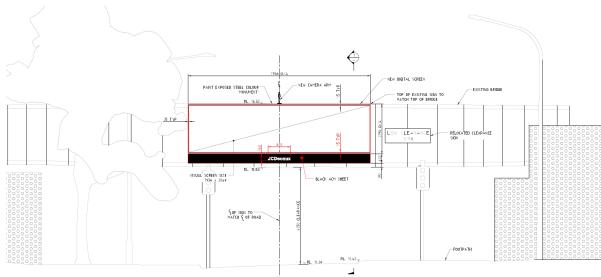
Proposed Digital Sign on South Approach (Elevation Plan)
